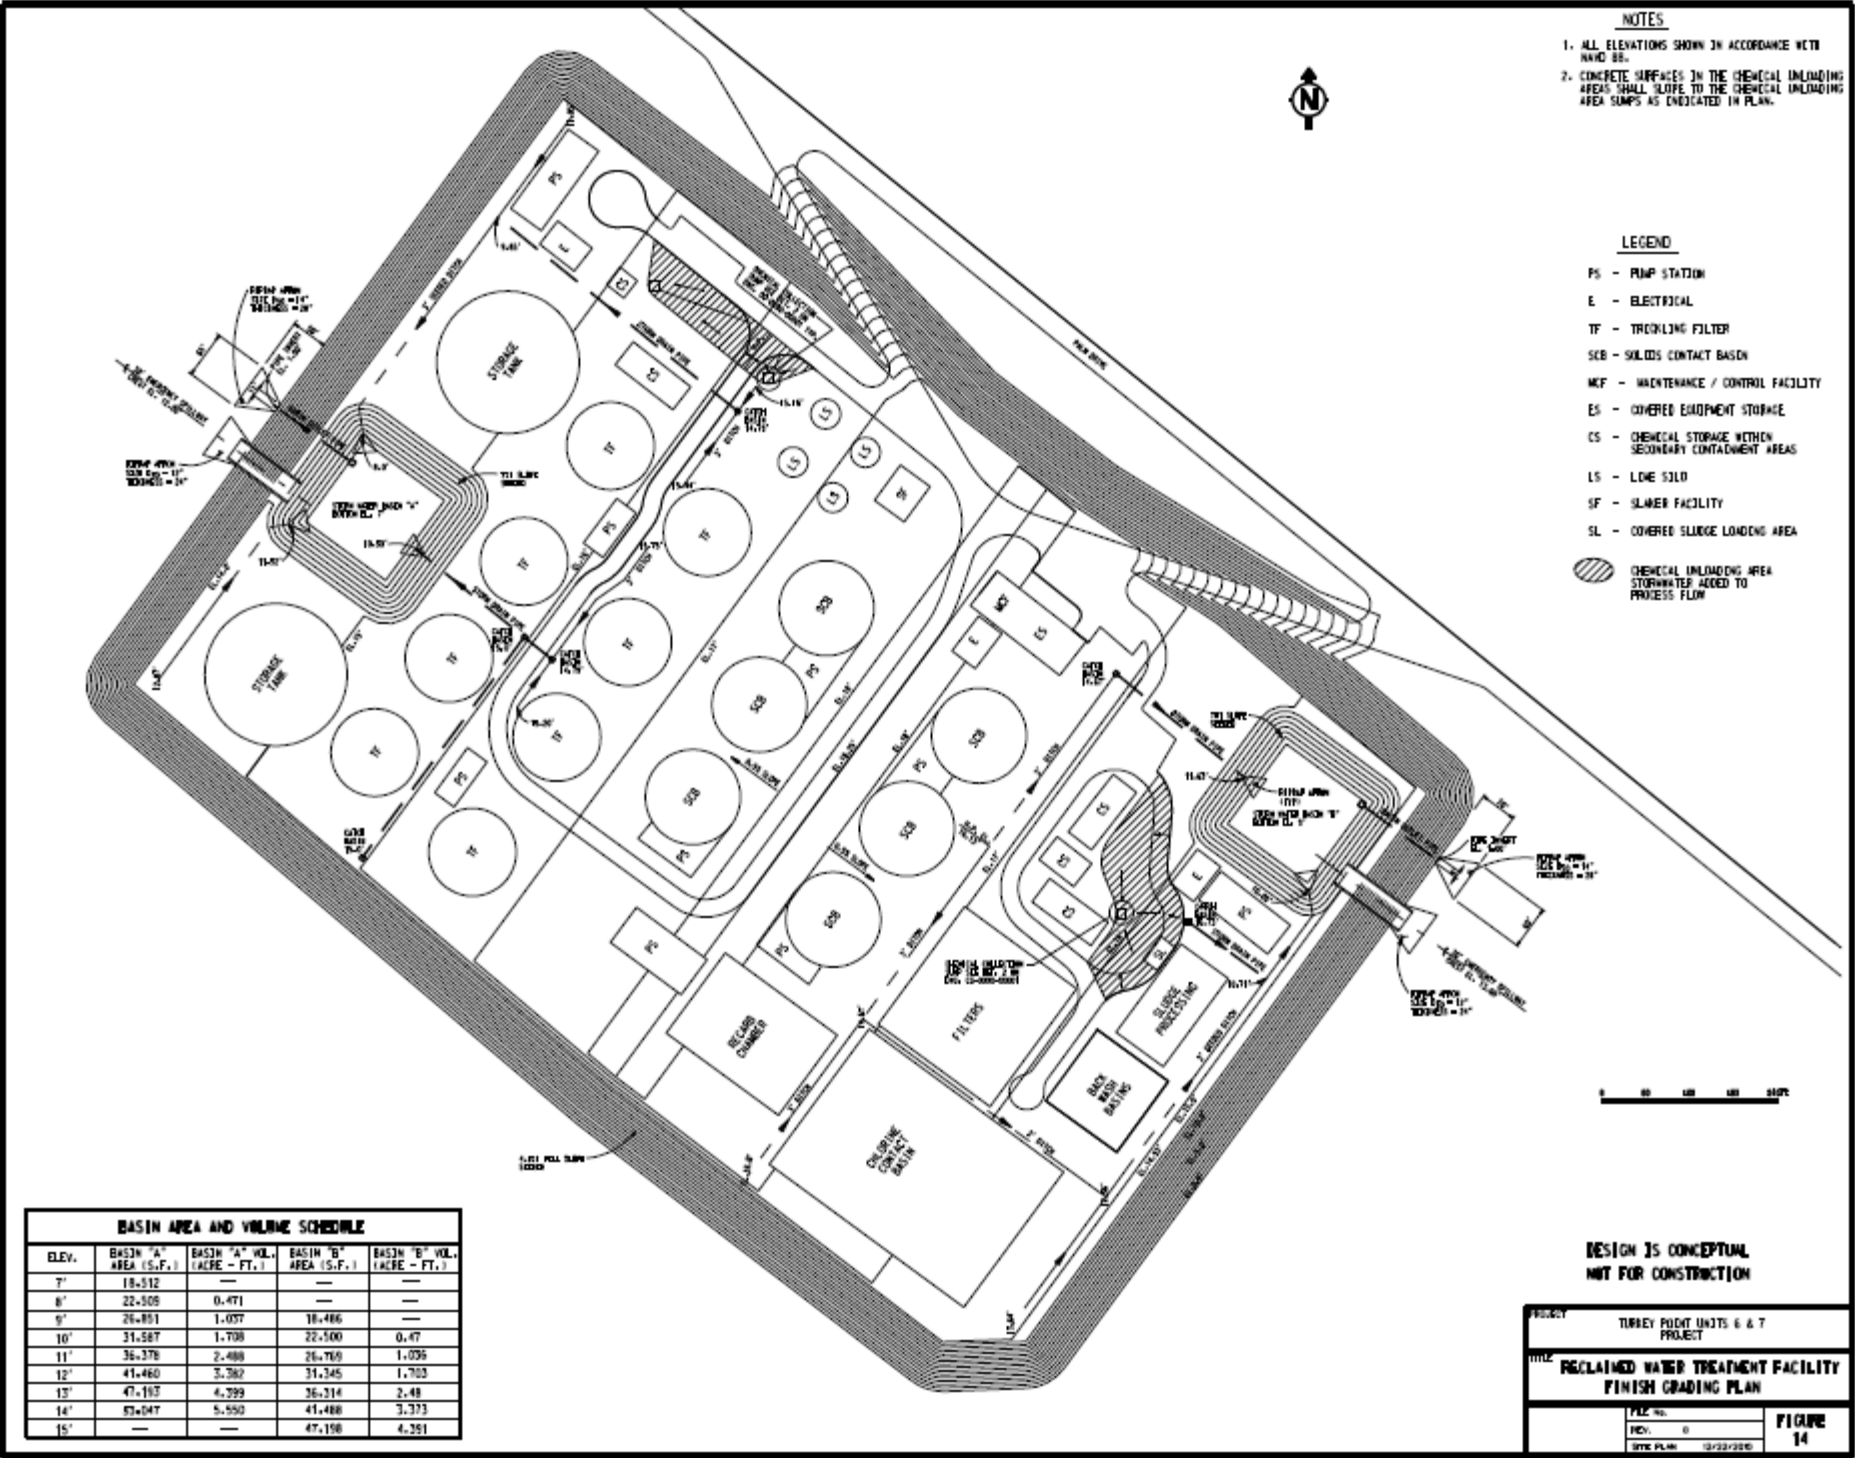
Turkey Point Unit 6 & 7 Reclaimed Water Treatment Facility Finish Grading Plan
